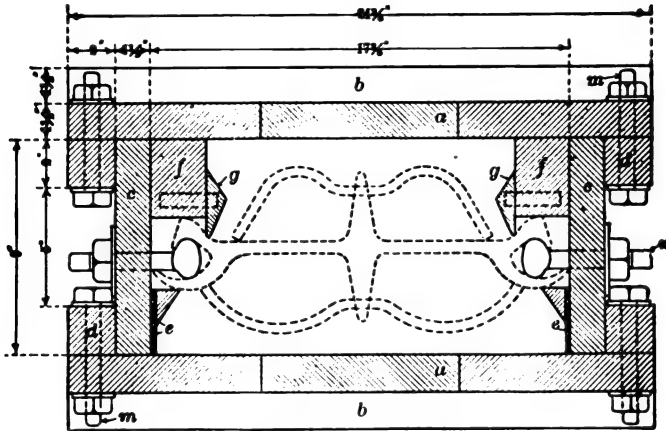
LACKAWANNA REINFORCED CONCRETE SHEET PILING.
